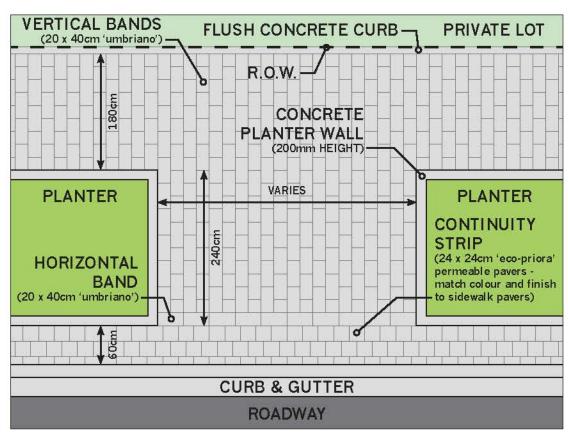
Sidewalk paving plan detail (north side of Highway 7).
